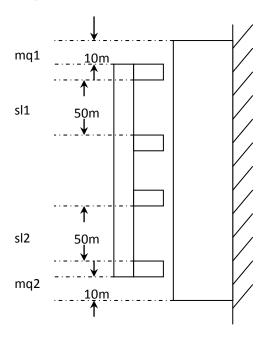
Re-Leveling Door Zone Switches Position
